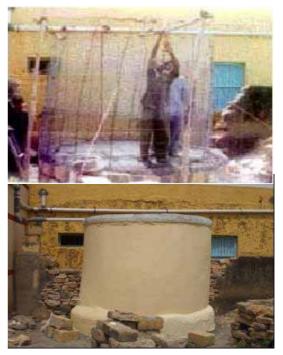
Construction of rooftop rainwater harvesting system in the school buildings
